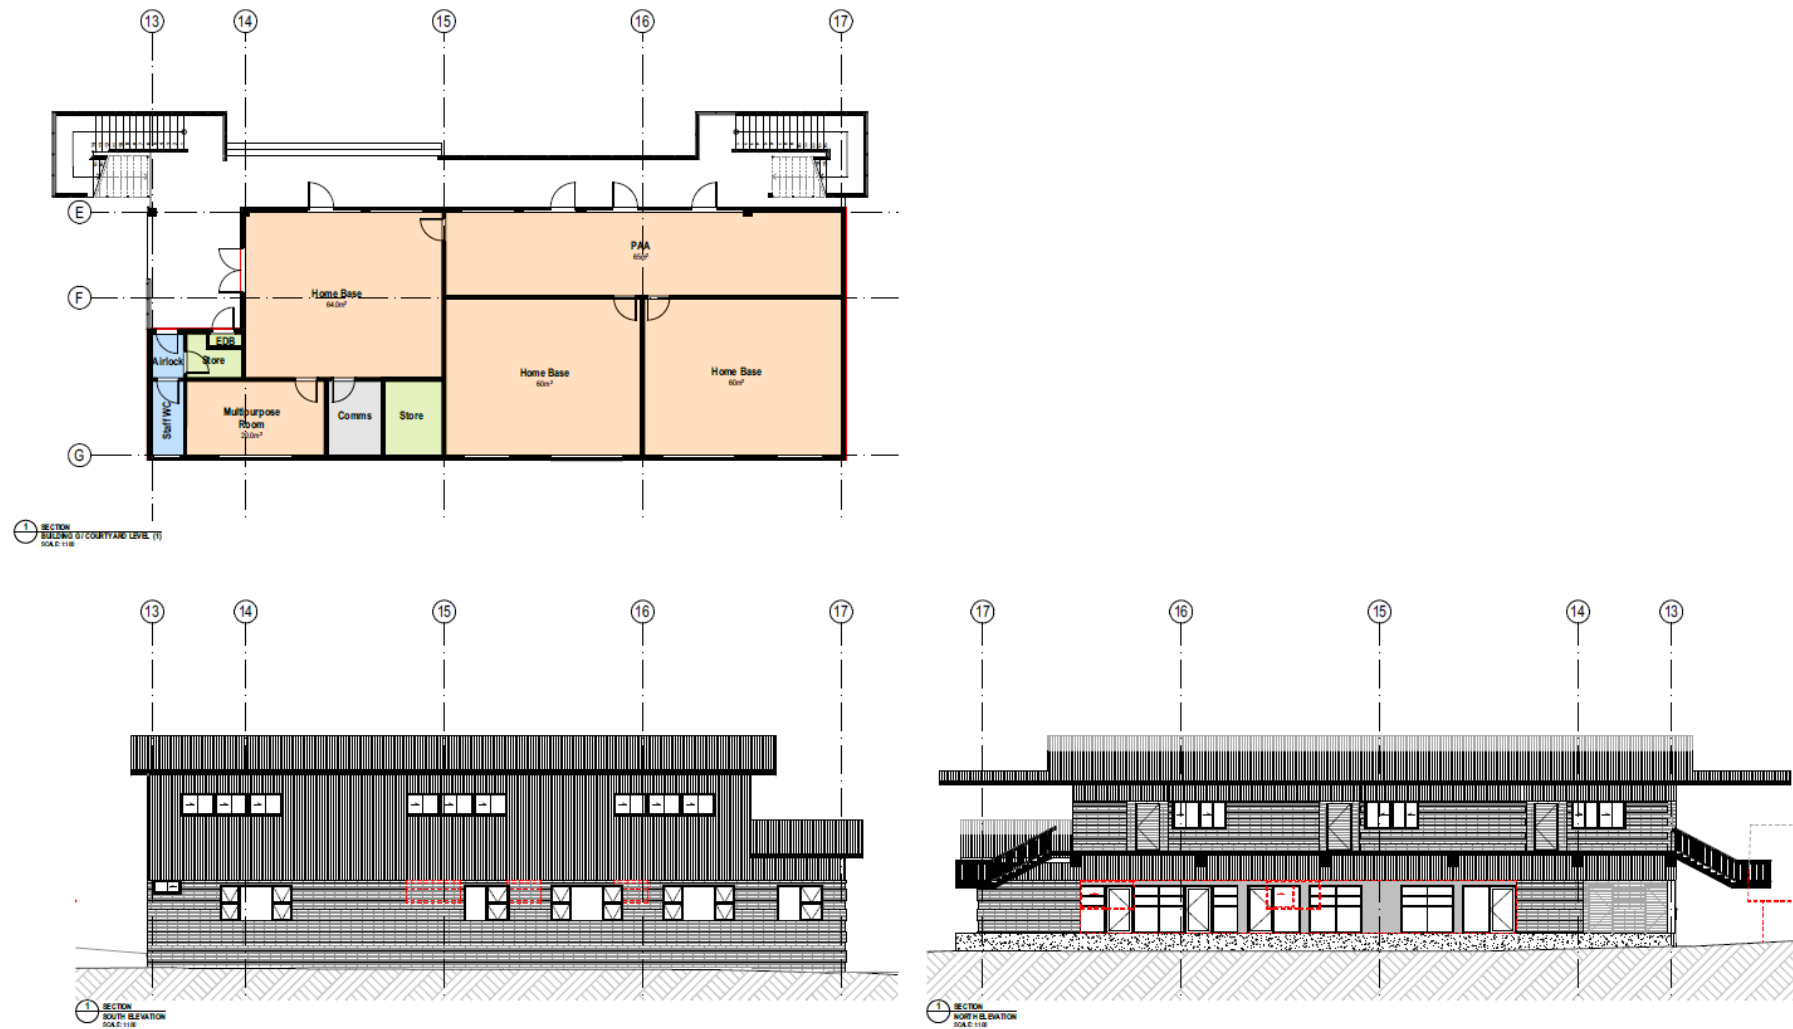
Proposed Building G Courtyard Level Plan, South and North Elevations. Source: Fulton Trotter, 2021
